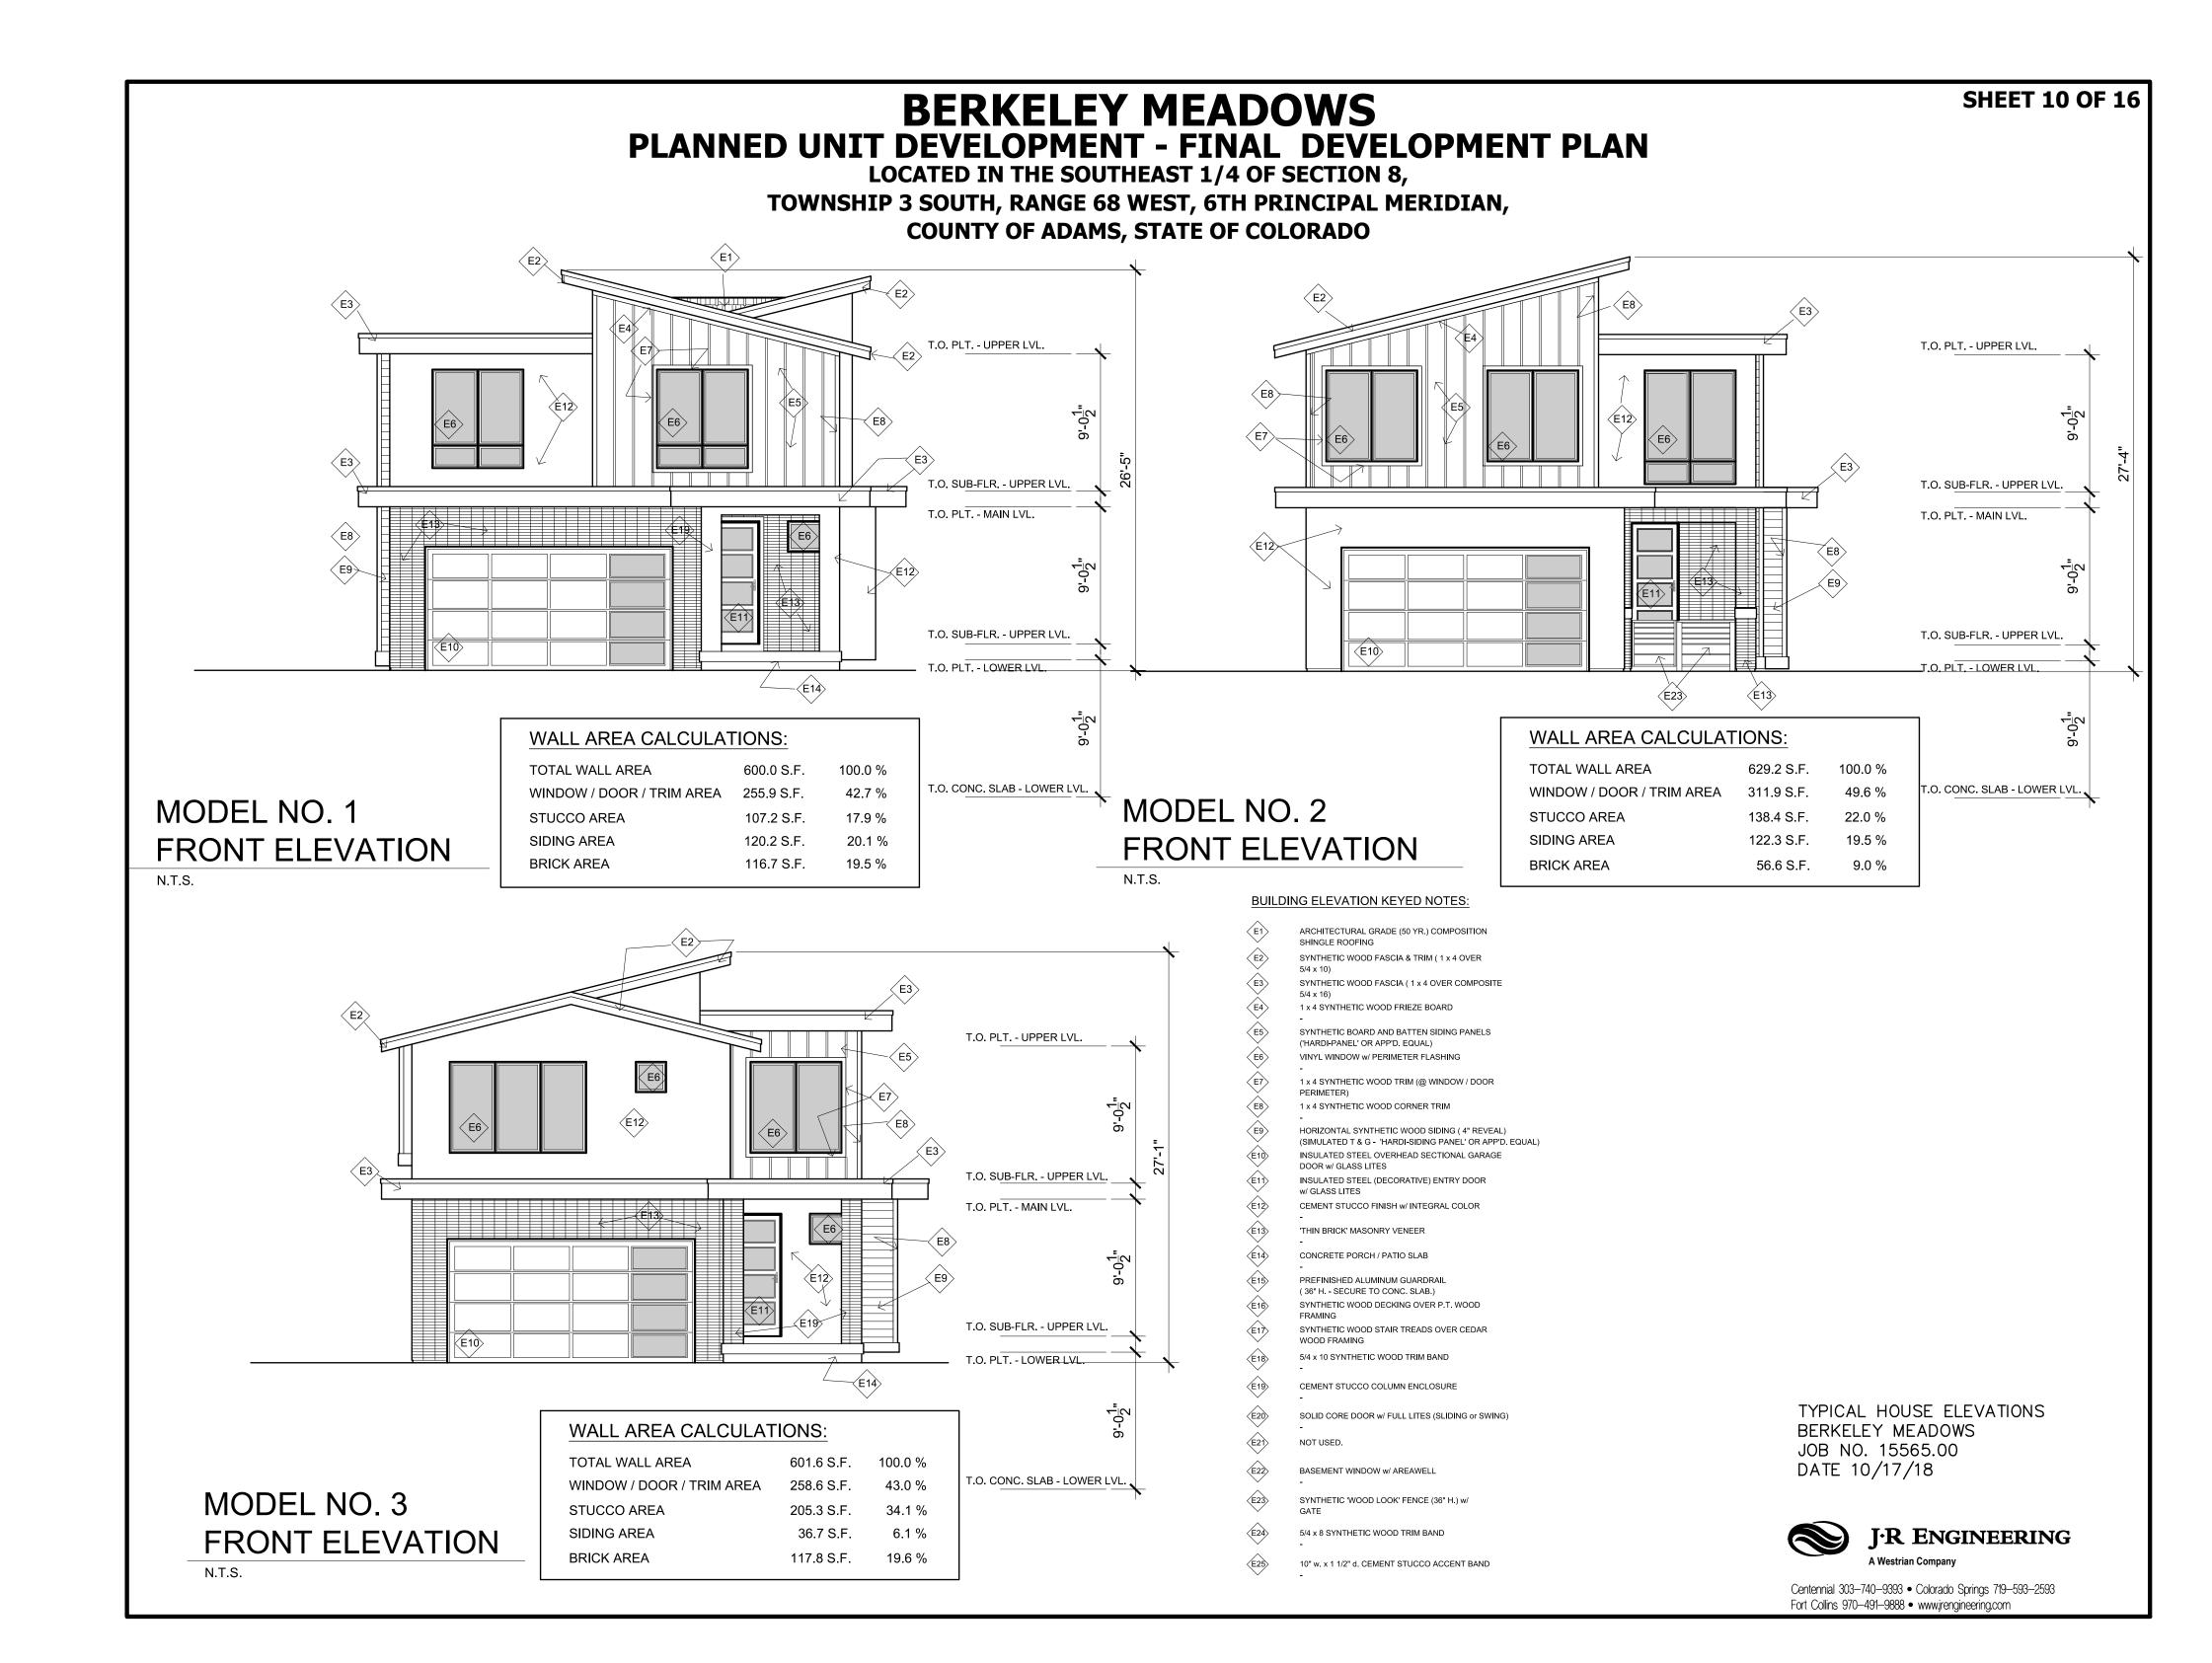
DETAILS BERKELEY MEADOWS JOB NO. 15565.00 DATE 10/17/18
